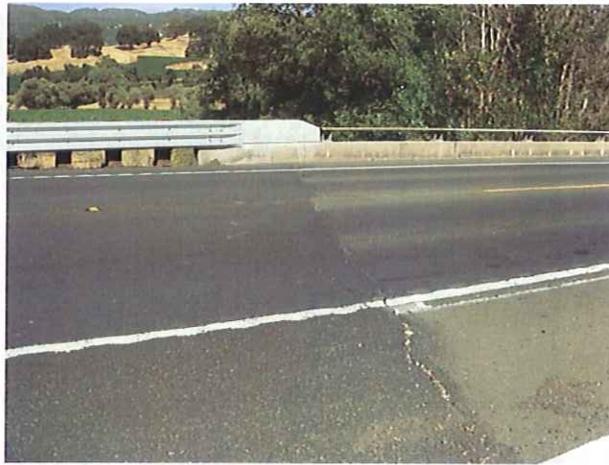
Bridge 10-0004 deck and barriers (with asbestos barrier rail shims)
